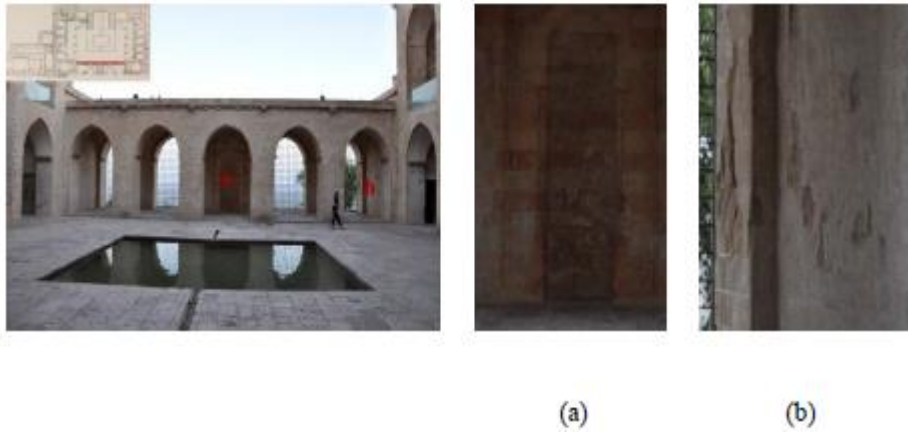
Deteriorations in the wall on the south façade of the building facing the courtyard: change of color, defective repair (a), loss of surface (b)
